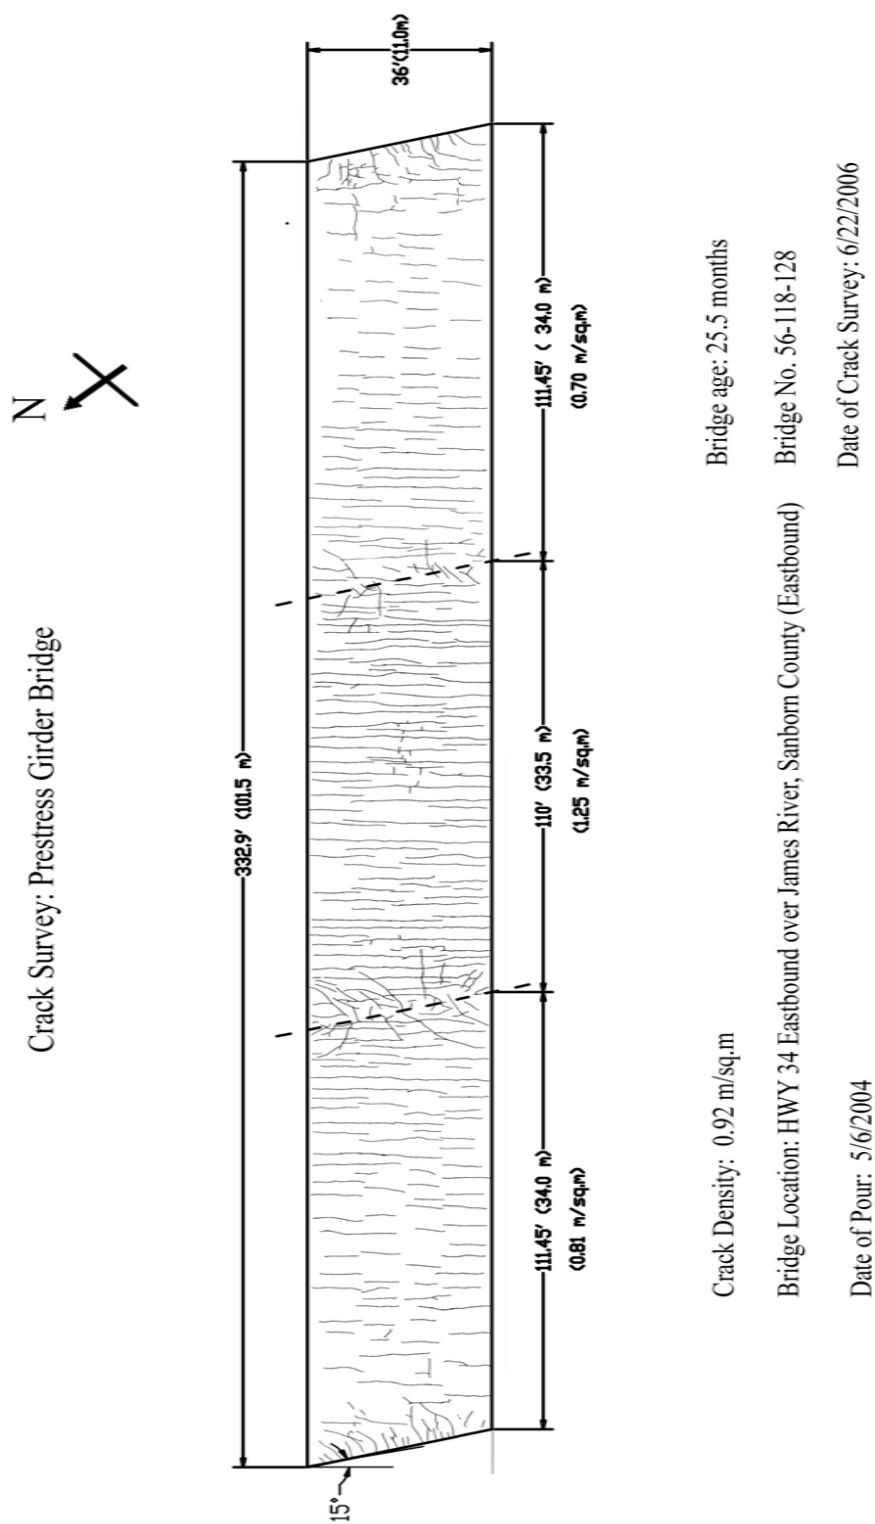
Prestressed Girder Bridge #56-118-128 Crack Survey
